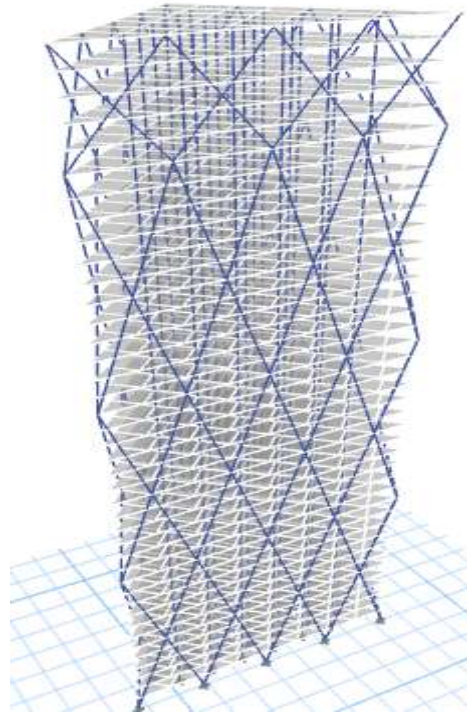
Elevation of G+40 Building with 12 storey module Diagrid system.
